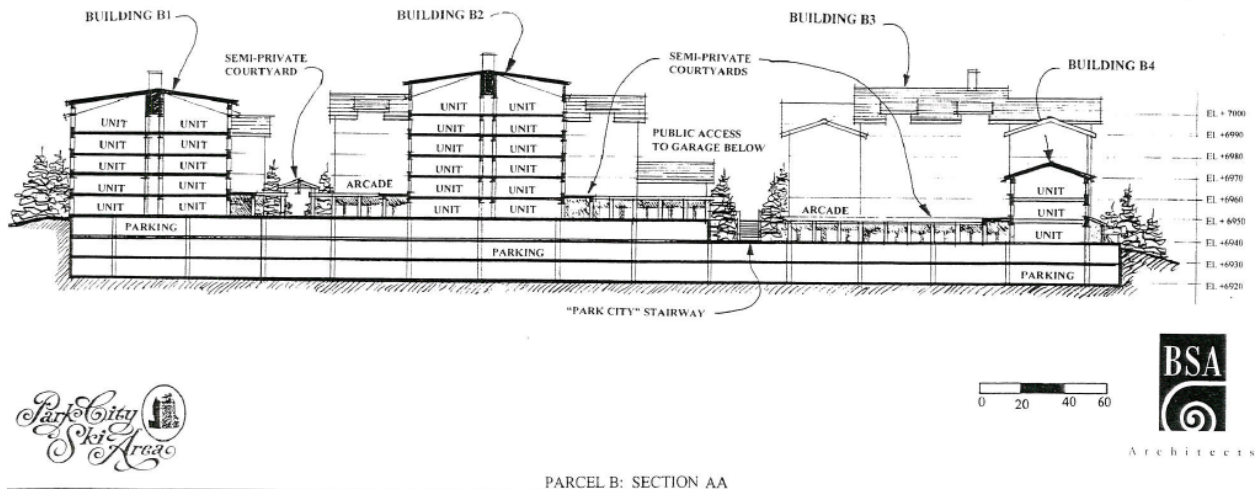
Section View of Parcel B, from the 1998 Master Plan Study. Note that the vast majority of parking appears to be below grade.
